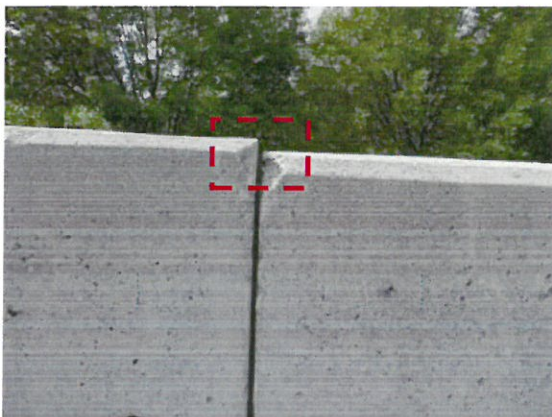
Differential vertical elevation at expansion joint on perimeter bumper wall along expansion joint on roof level
